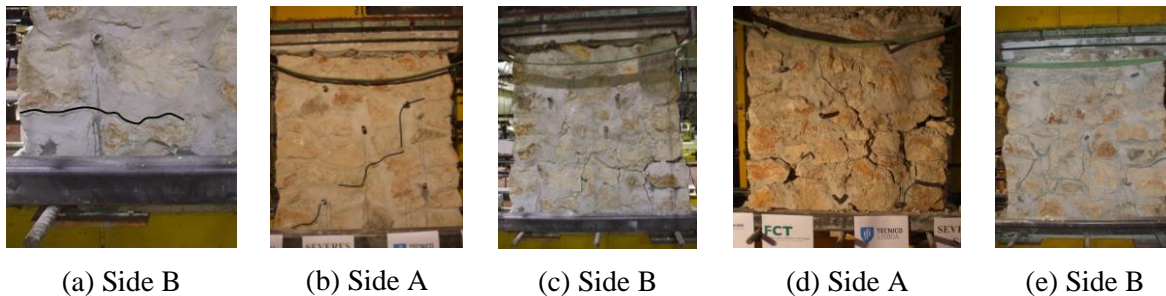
Specimen SR2. First visible crack (a-c); Collapse mechanism (d and e)
